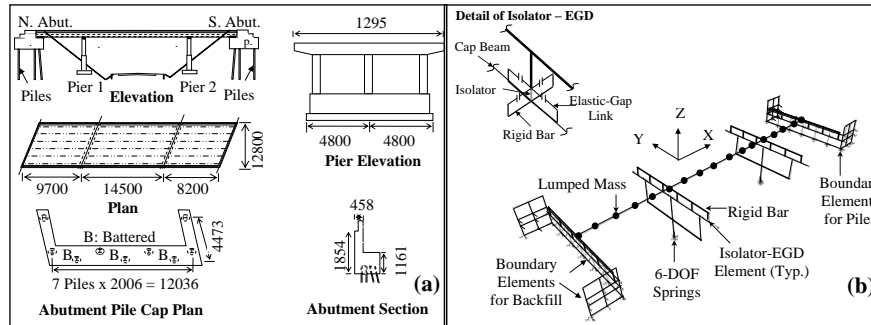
(a) Details of the bridge (dimensions are in mm), (b) Structural model of the bridge.
